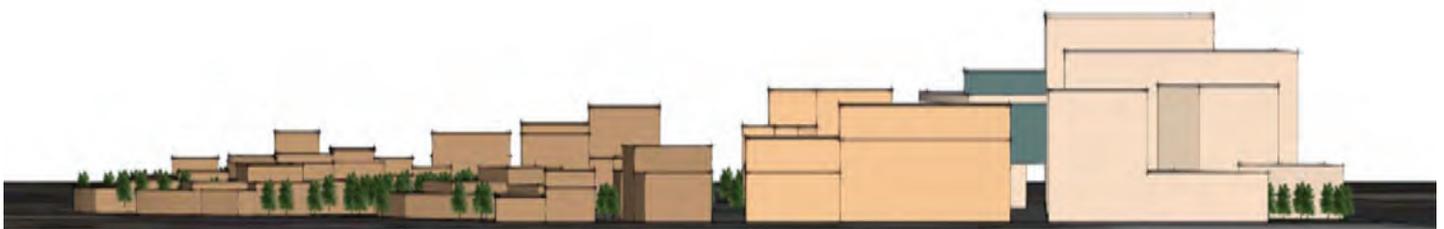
Taller buildings could locate along the highway; internal buildings would taper down to match existing building heights
